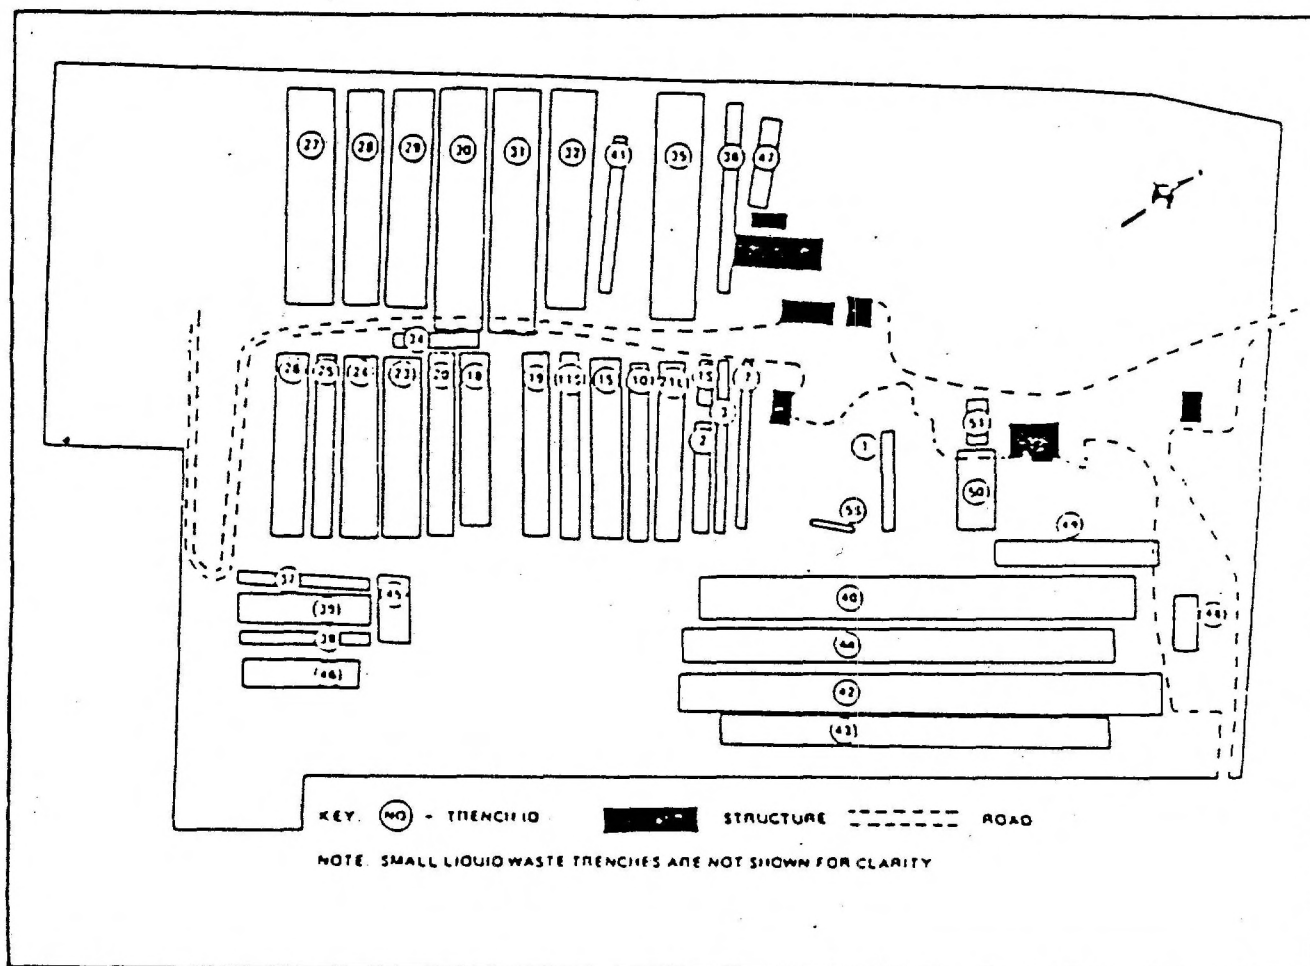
Trench locations as of 1987 at the Maxey Flats site.
